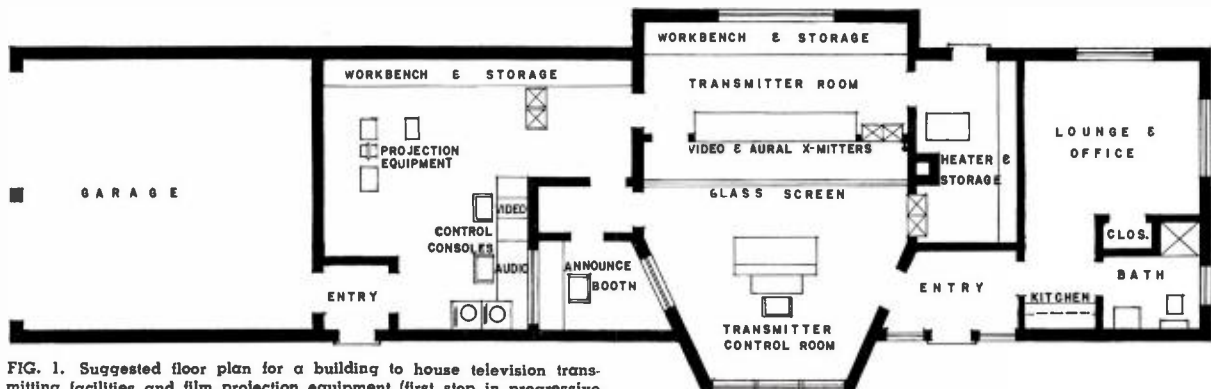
Suggested floor plan for a building to house television transmitting facilities and film projection equipment (first step in progressive plan outlined by the authors).
